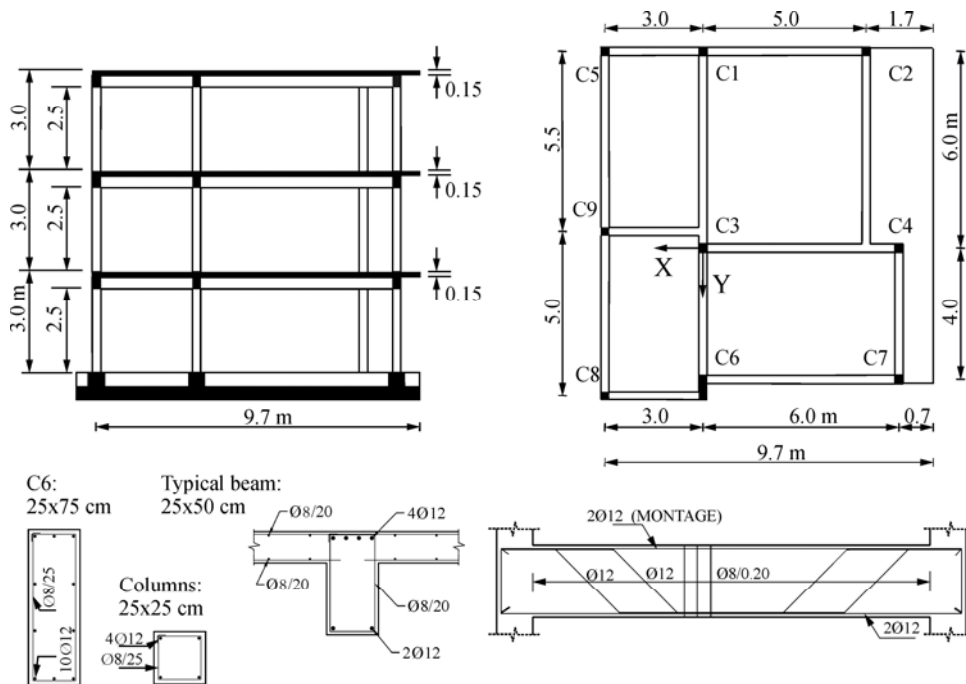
Elevation and plan view of the SPEAR building, showing typical reinforcement details.
